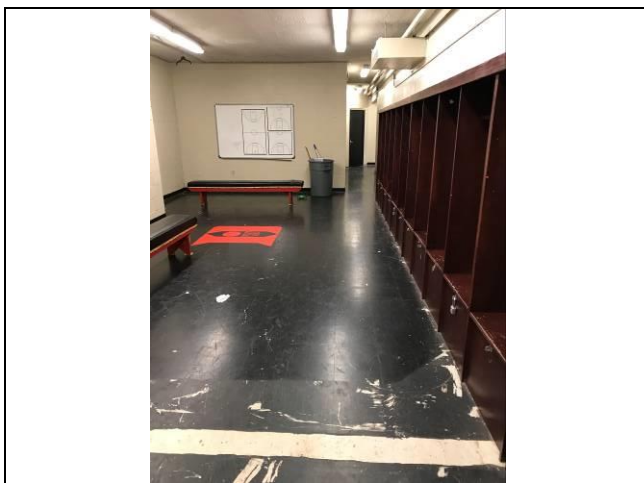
Typical interior finishes inside the men's locker room in Davis Gym.
